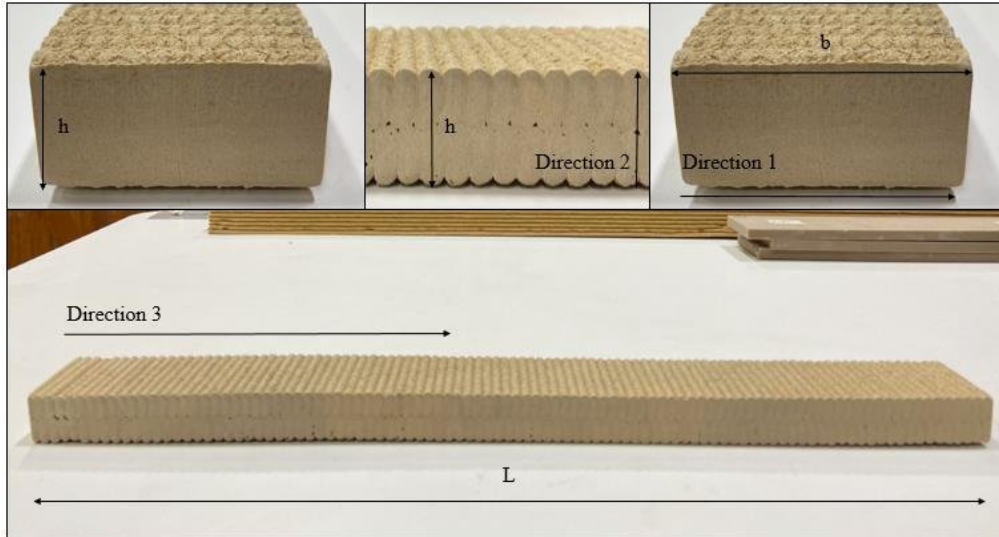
Dimensions and printing directions for set TP1.0 as-printed prismatic aligned in direction-3
